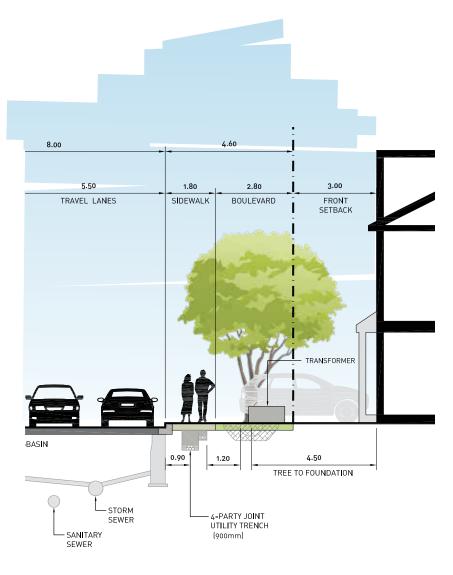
16.5m Local Road with Curb-Face Sidewalk
